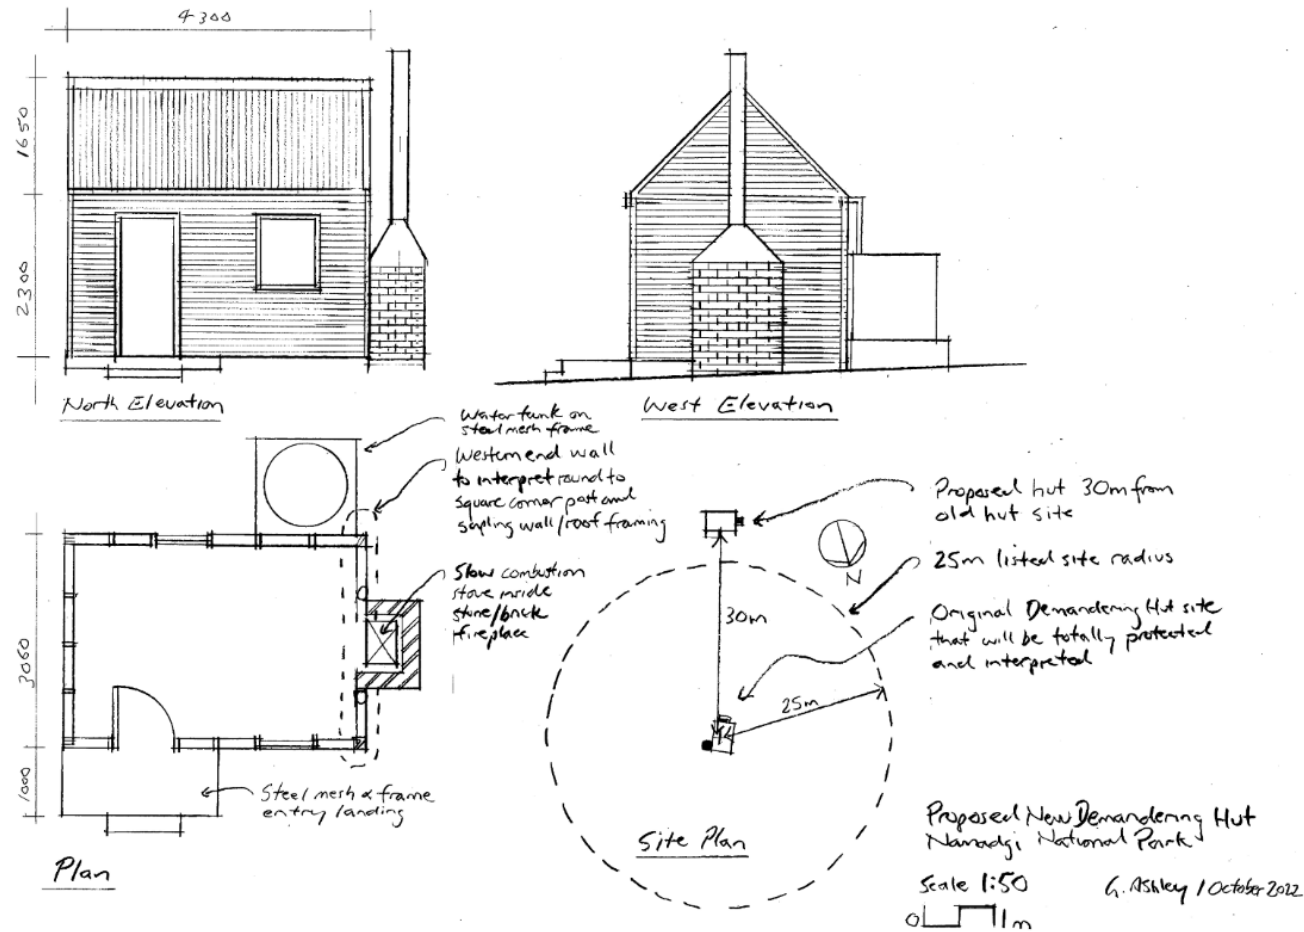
New Demandering Hut Structure — site plan showing original hut place and new hut, floor plan and elevations. (Source: G Ashley)
